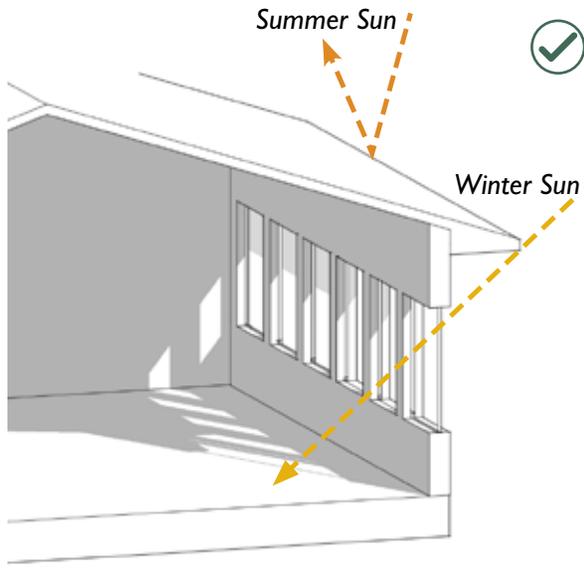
Shape a building's mass to maximize solar energy potential. An eave overhang protects the wall material and also assists in cooling the building in the summer.
